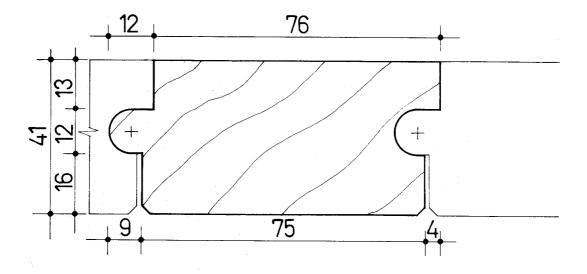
100 mm x 50 mm TONGUE AND GROOVE SECRET NAIL FLOORING (full size)
